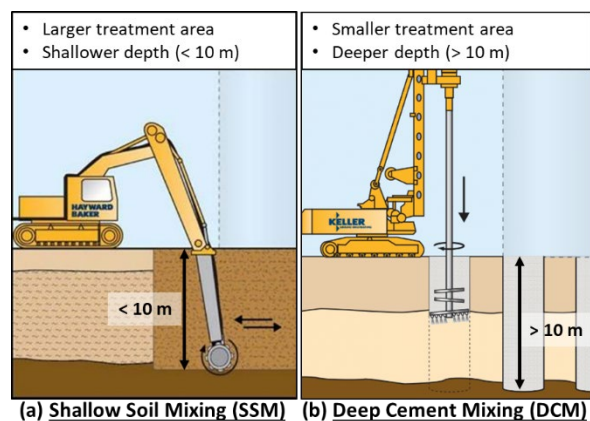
Schematic illustration for Shallow Soil Mixing (SSM) and Deep Cement Mixing (DCM) [2].
